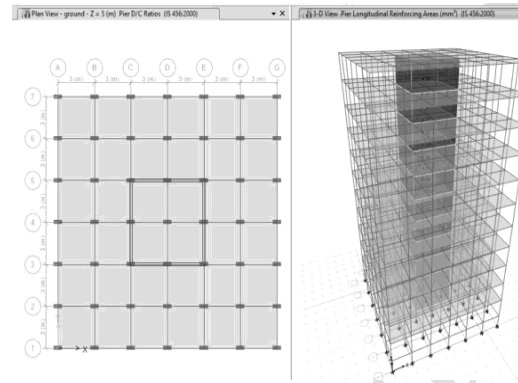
Model:2 Building with Box-type Shear Wall at the centre of the geometry (Building with shear wall inform of core)
